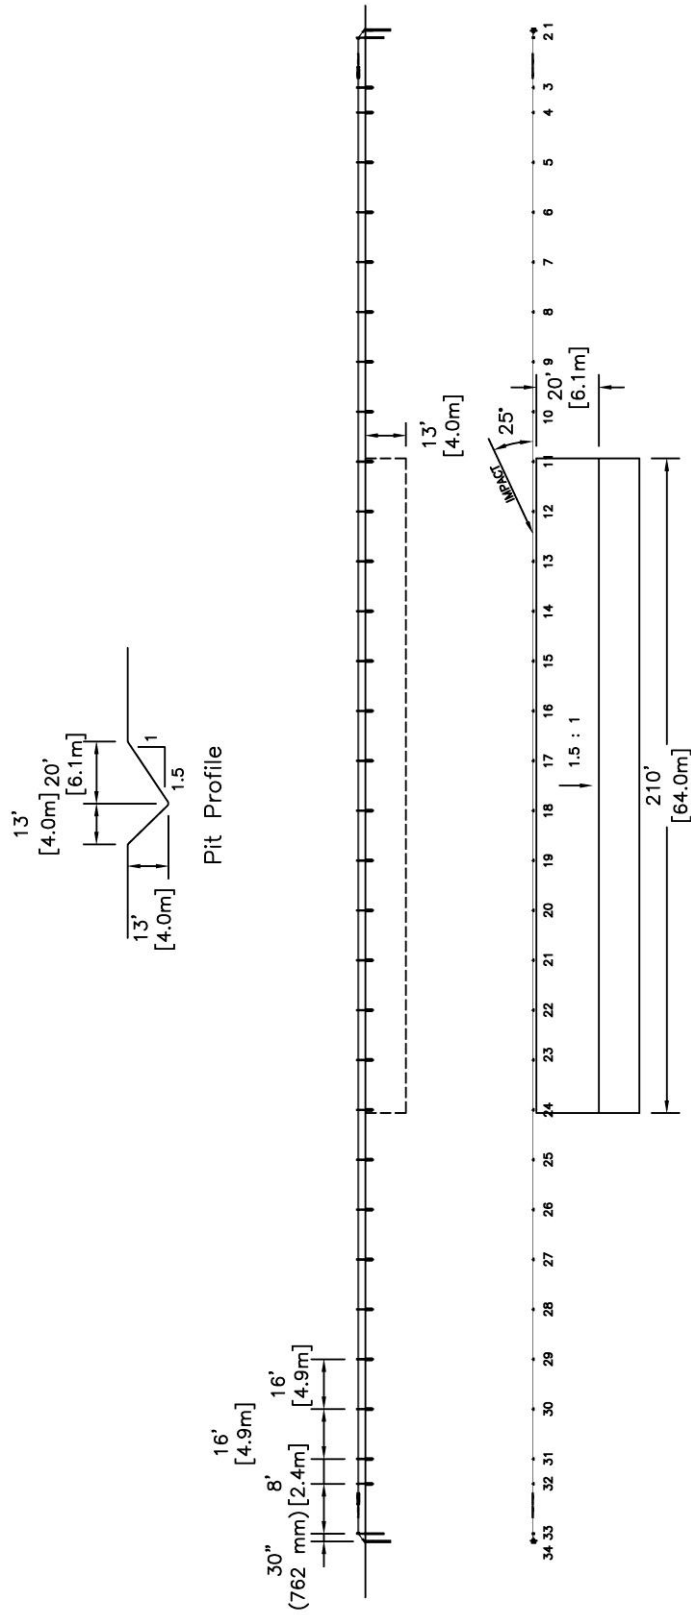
Cable Guardrail System Details, Test No. CS-1 [44]
